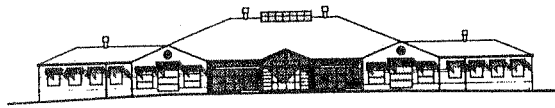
RECRUIT SCHOOL - ADMINISTRATIVE/INSTRUCTIONAL BUILDING - ARTIST'S SKETCH
